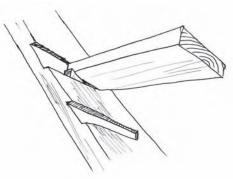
Installation of a tread into the checkout in the stringer with the use of a wedge
